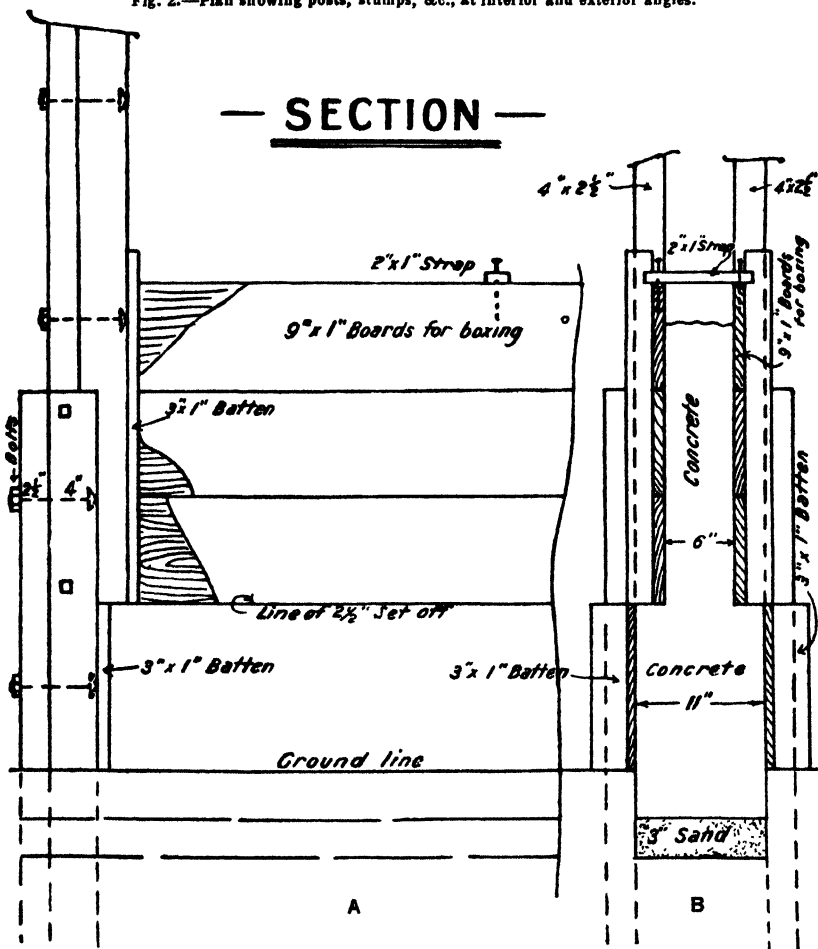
Showing A, exterior elevation at angle, and B section.
